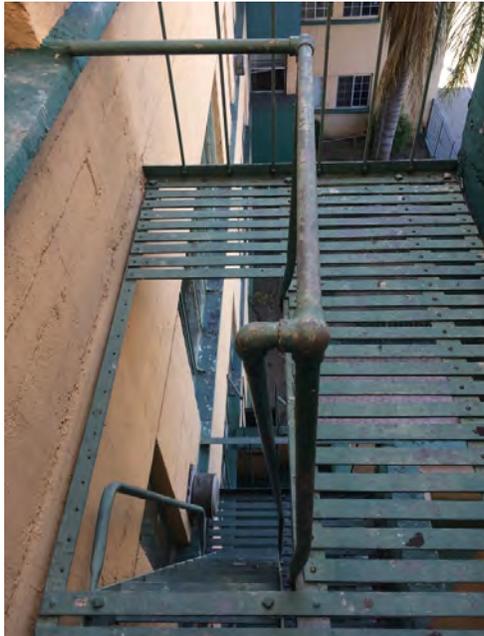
East side of building west side of rooftop service room. Camera facing S.
